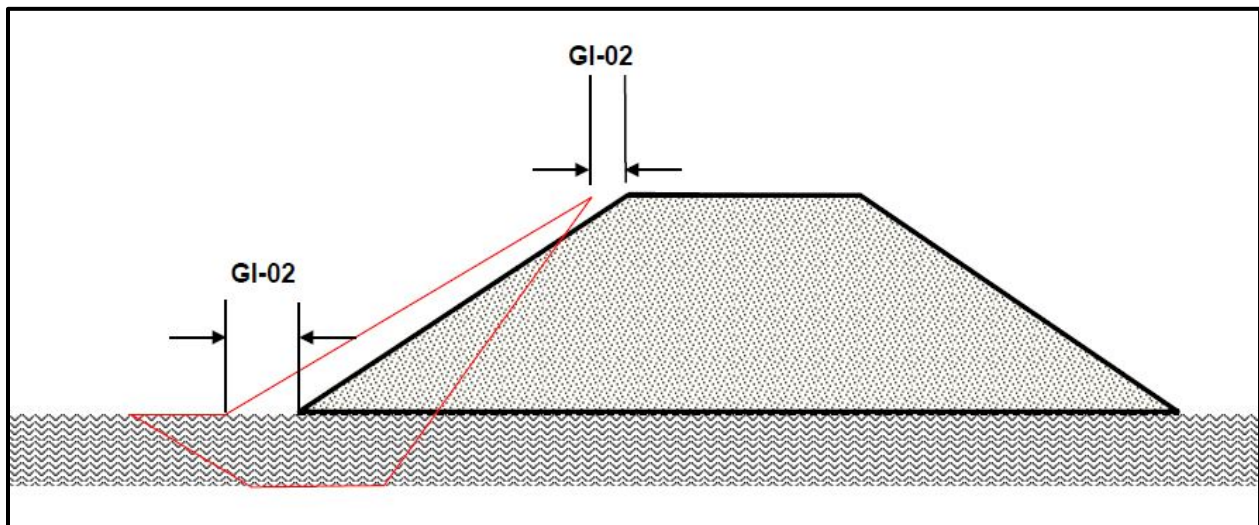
, Embankment Sliding Block Instability at Bridge End Bent
